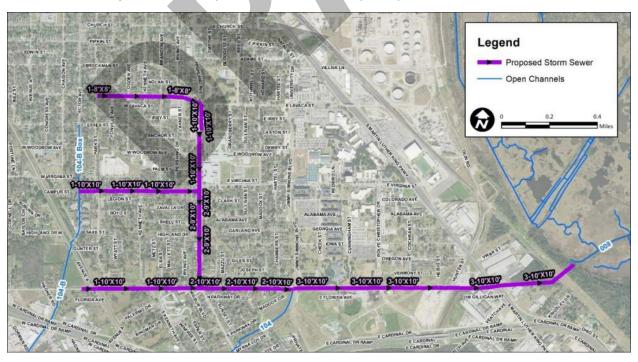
Proposed South Park Diversion – Storm Sewer Alignment
